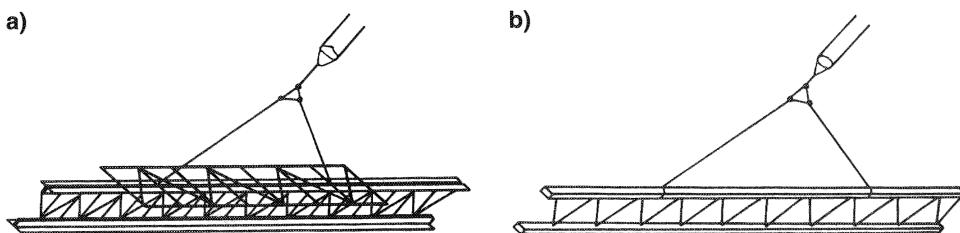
Lifting lattice girders a) Lattice girder of open sections with temporary traverse stiffener or lifting cradle b) Hollow section lattice girder without temporary transverse stiffener or lifting cradle
